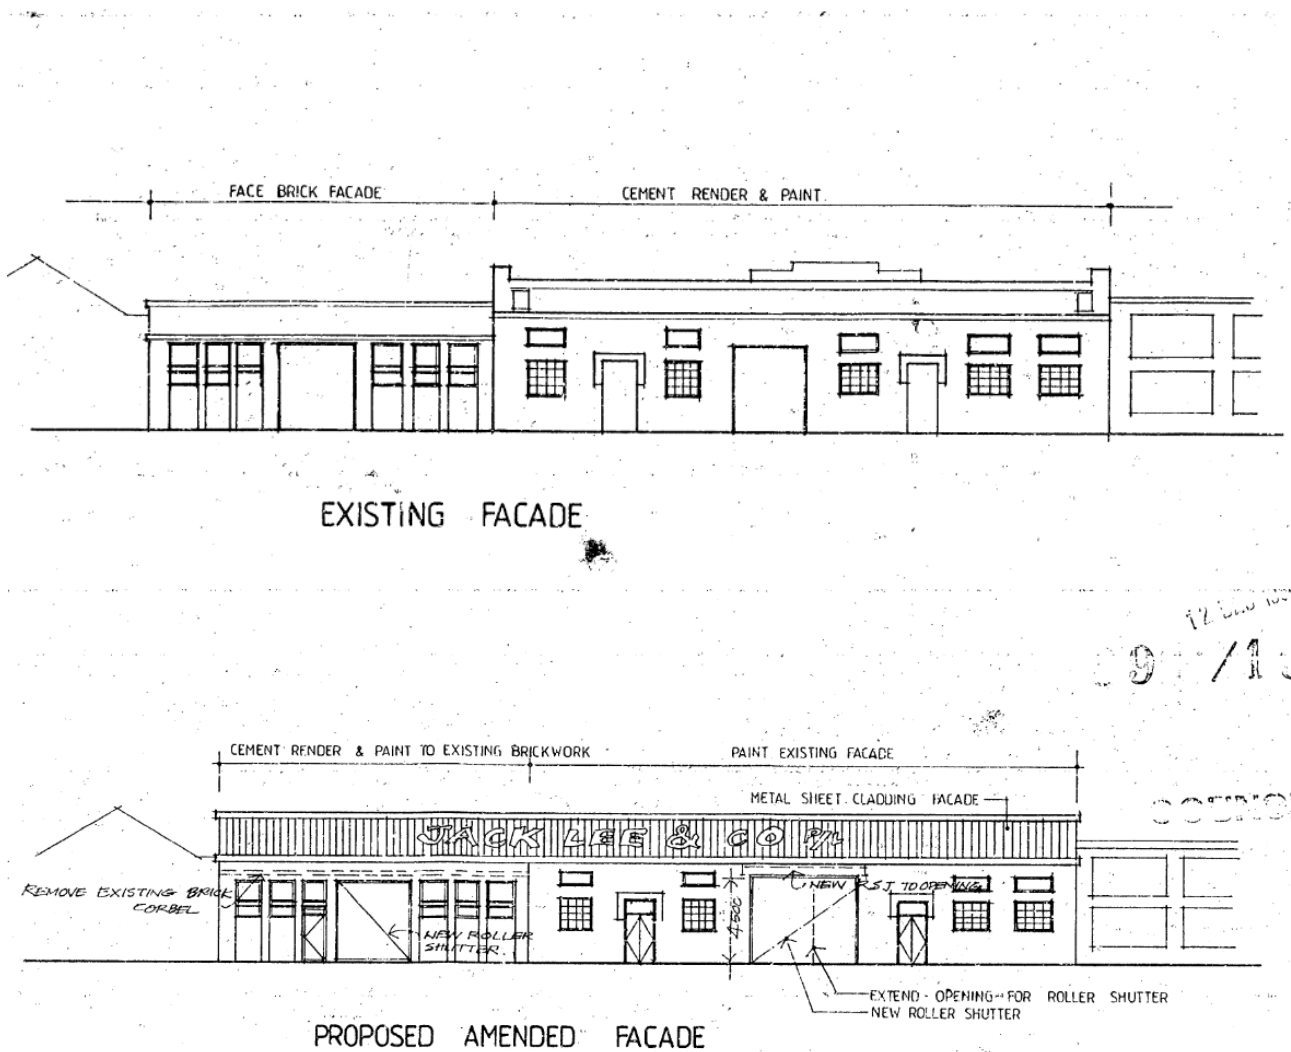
Detail from 1987 plans showing alterations to façade of subject site
